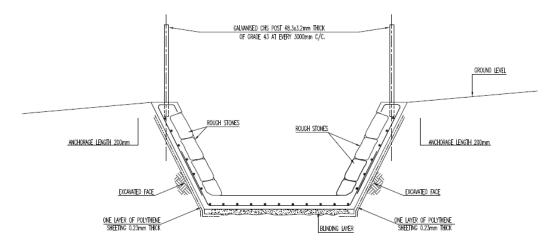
Typical Cross Section of Channel for Flood Water (source: JET)
